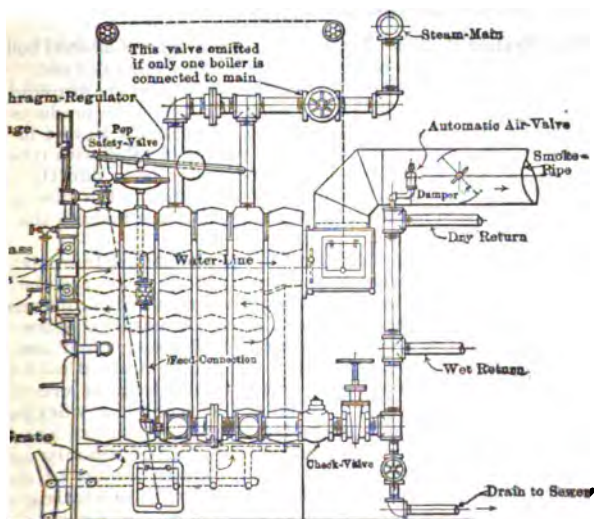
Trimmings and Connections for Sectional Steam-heating-boiler
